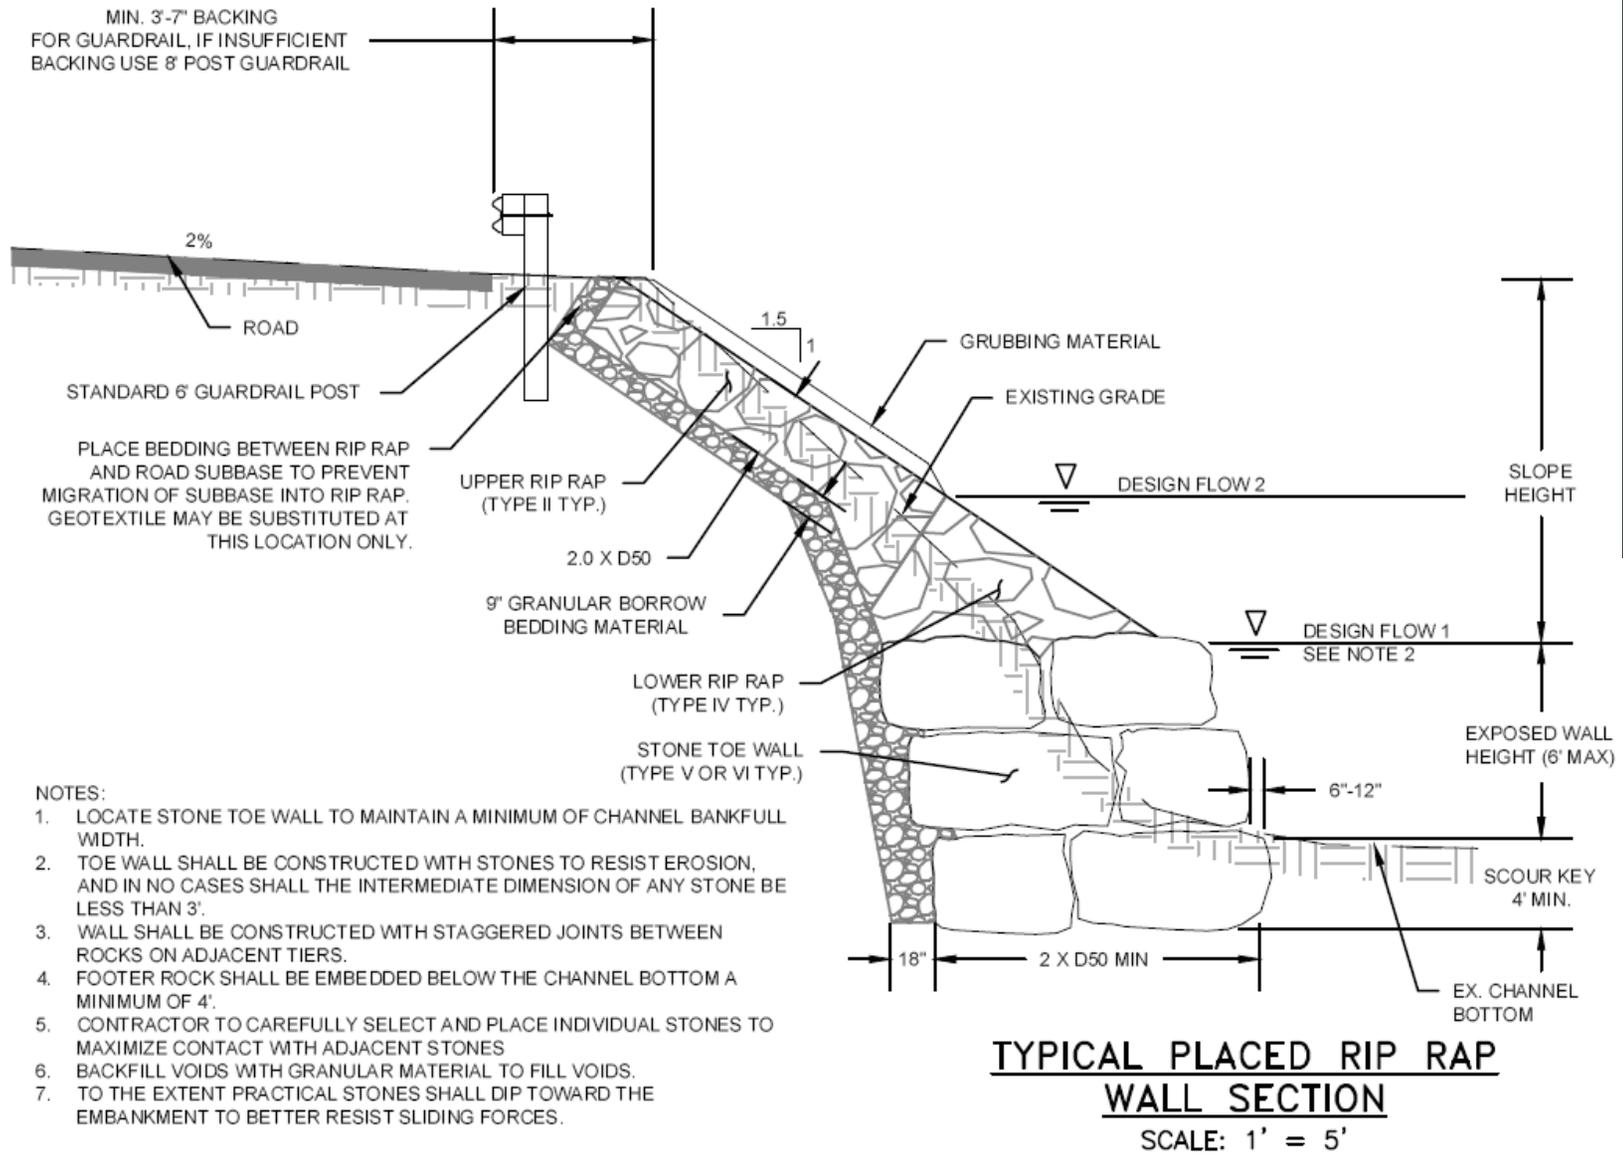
Placed riprap wall typical detail. (Source: Dubois & King and Milone & MacBroom, Inc., 5/1/2014)
